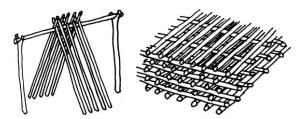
Treatment of wood before construction (source: Johan van Lengen, 2008)
